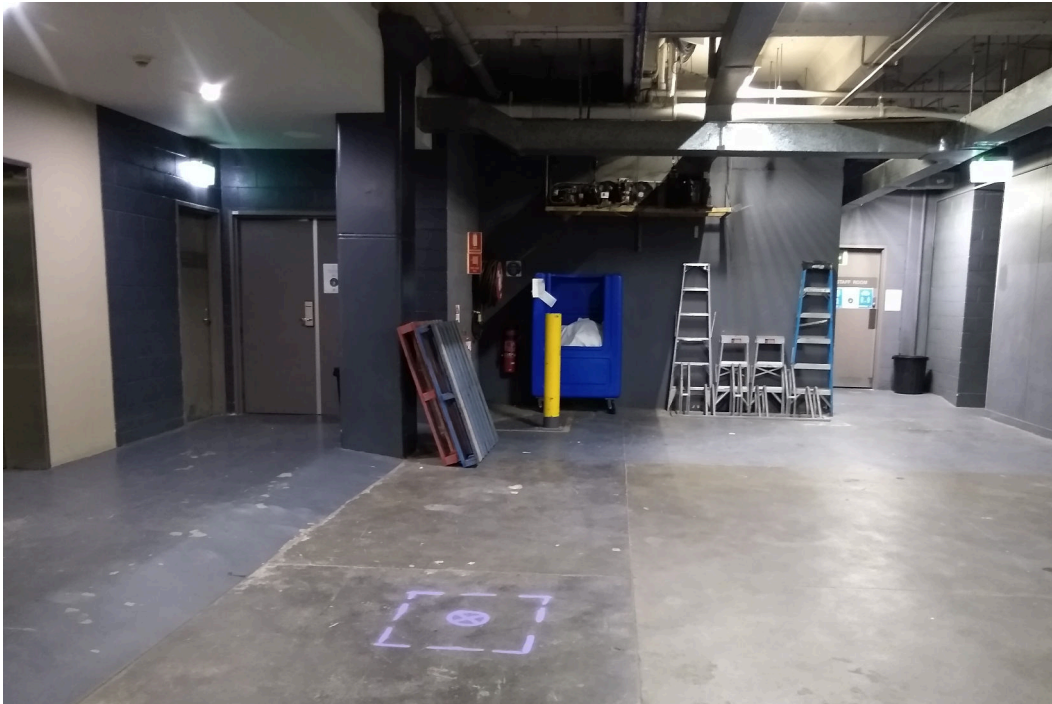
View north-west at the location of Borehole BH1001, within the Adina Hotel basement.
